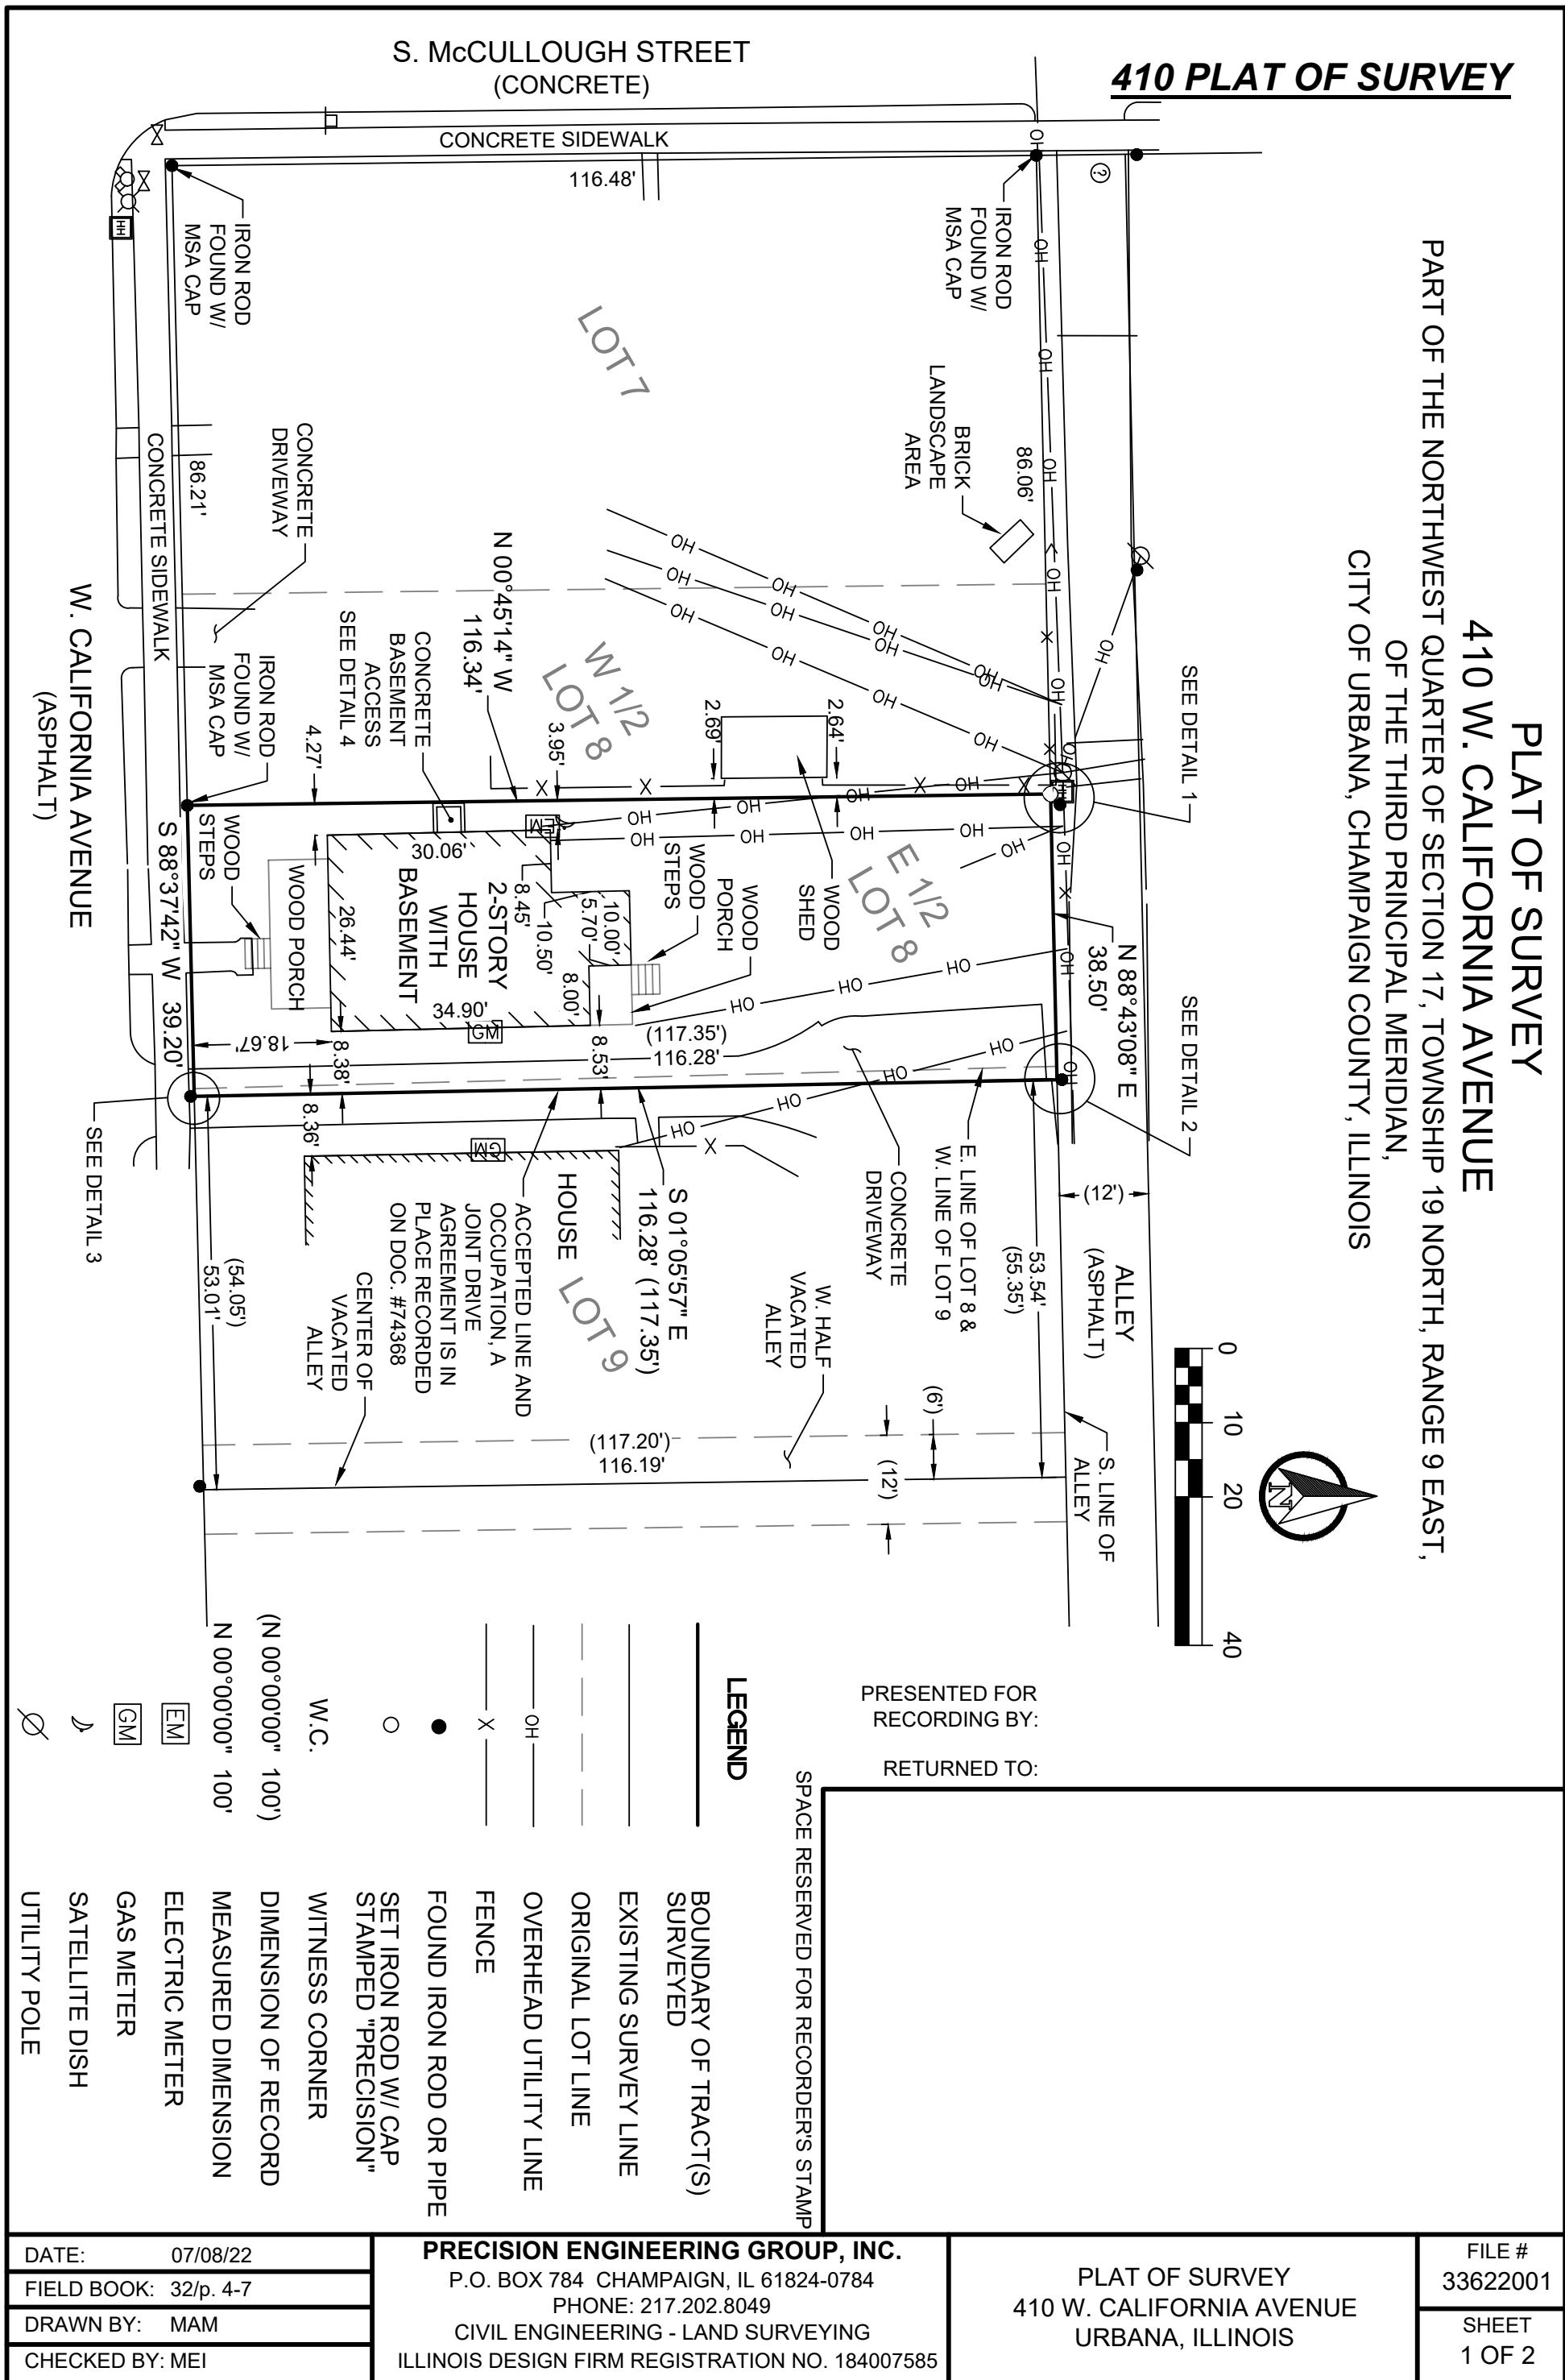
Exhibit D - Application, with Plans and Access Easement*410 PLAT OF SURVEY
